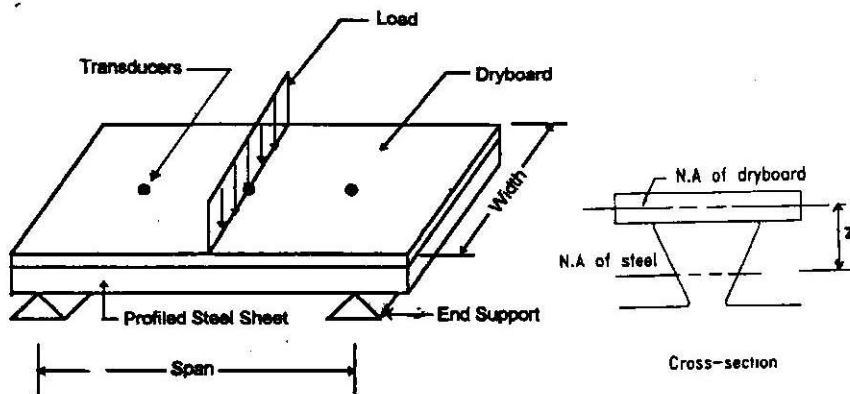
Typical test arrangement and one repeating cross-section of the panel
